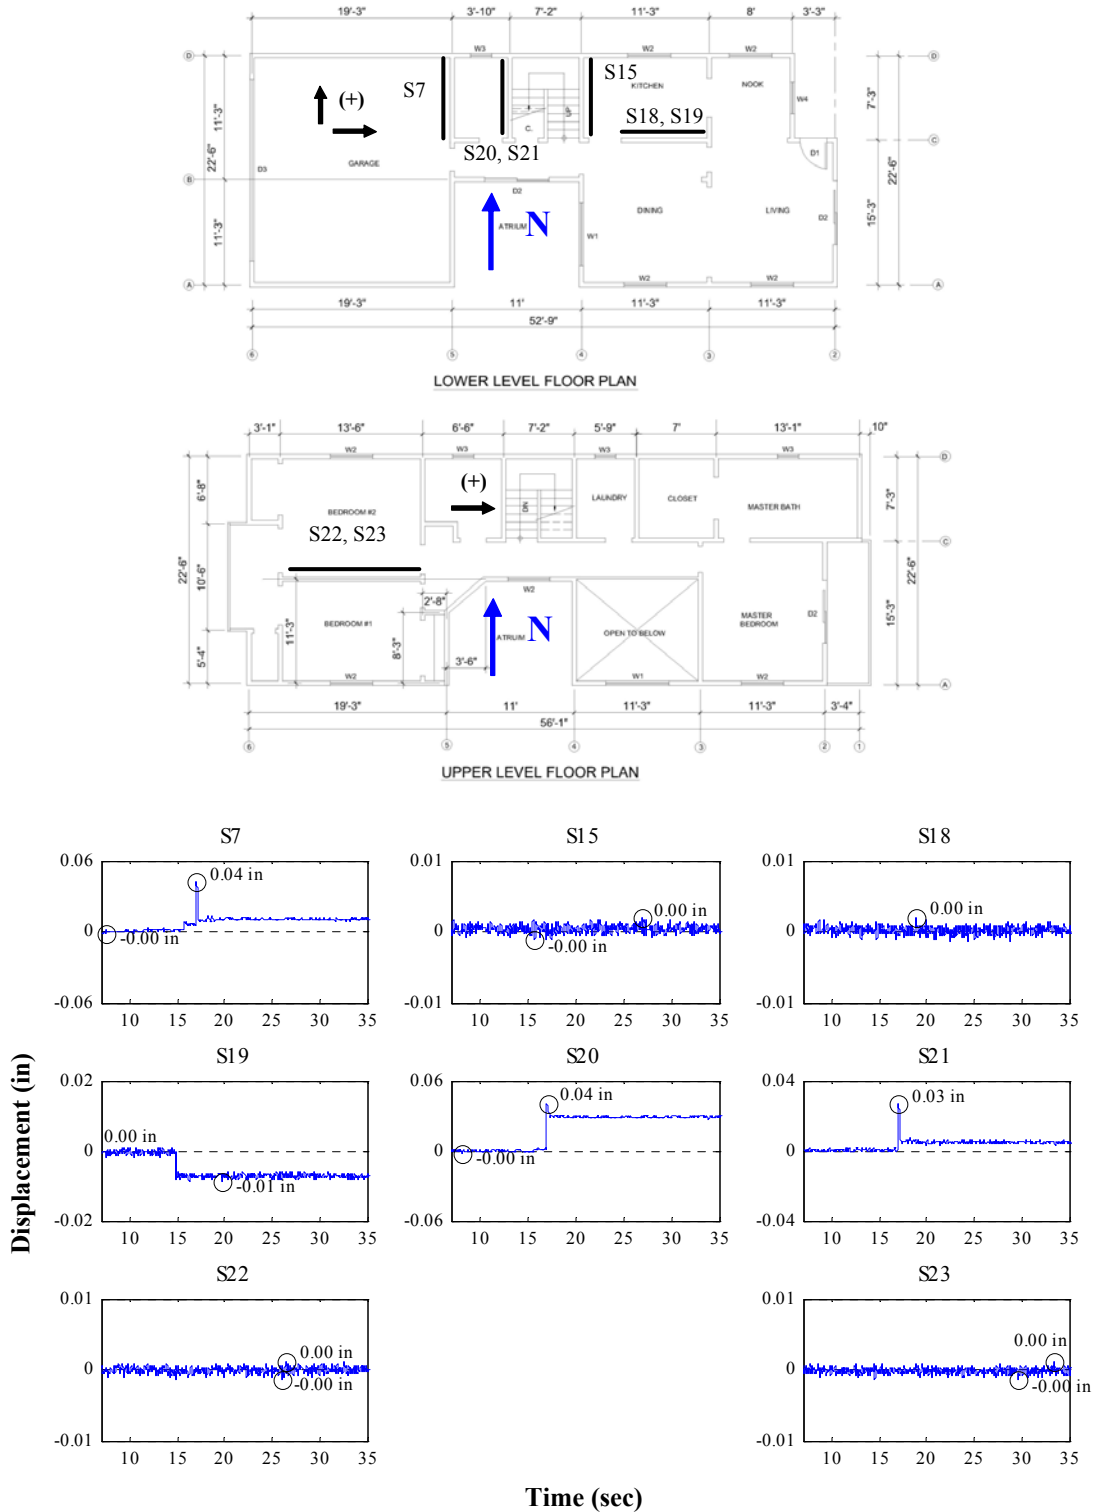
Wall deformations of internal walls for Test NWP1S02
